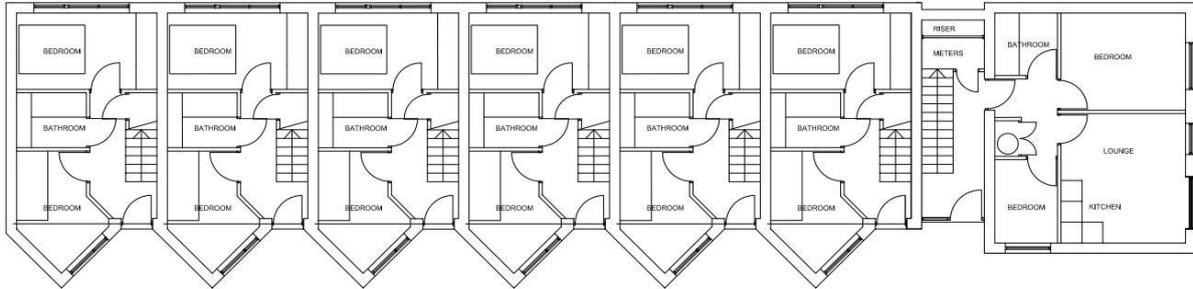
, the ground floor plan of the building. The upper floors to the 6 identical flats are an open plan living space with kitchen. The flat to the right is the first storey of three identical units. The building dimensions are approximately 36m by 8m and 9 m at the highest point.
